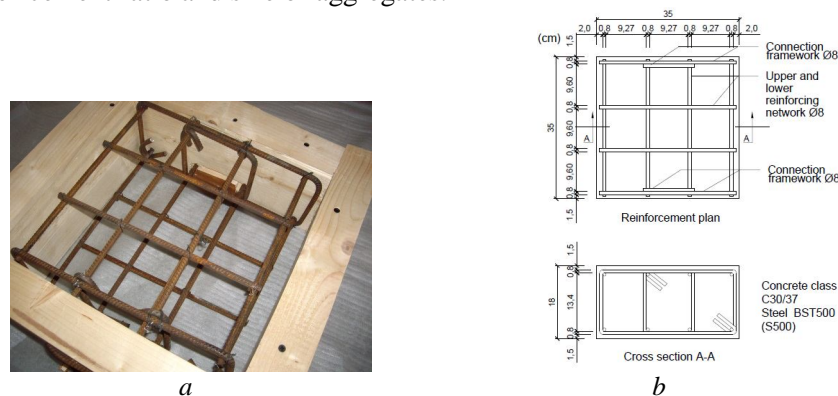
Realisation of specimens: *a* – formwork; *b* – reinforcement detail.
